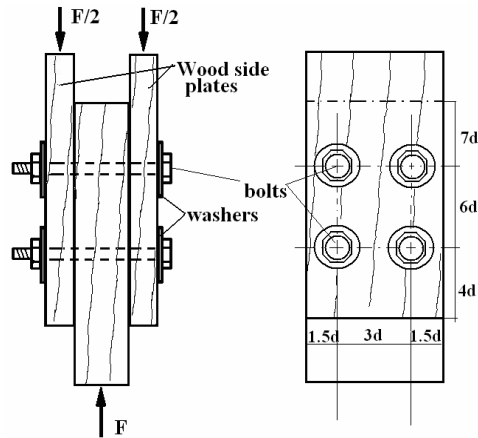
Testing arrangement with three member joints bolted with for bolts.
